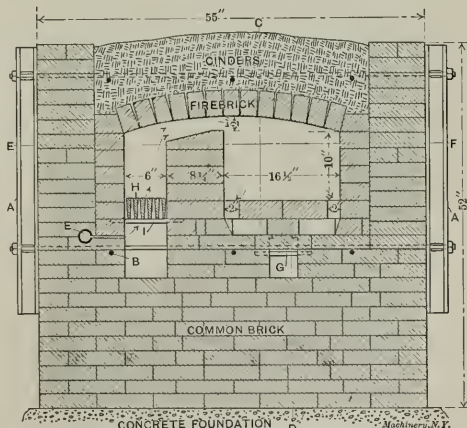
Case-hardening Furnace. Section in A-B, Fig. 3.
